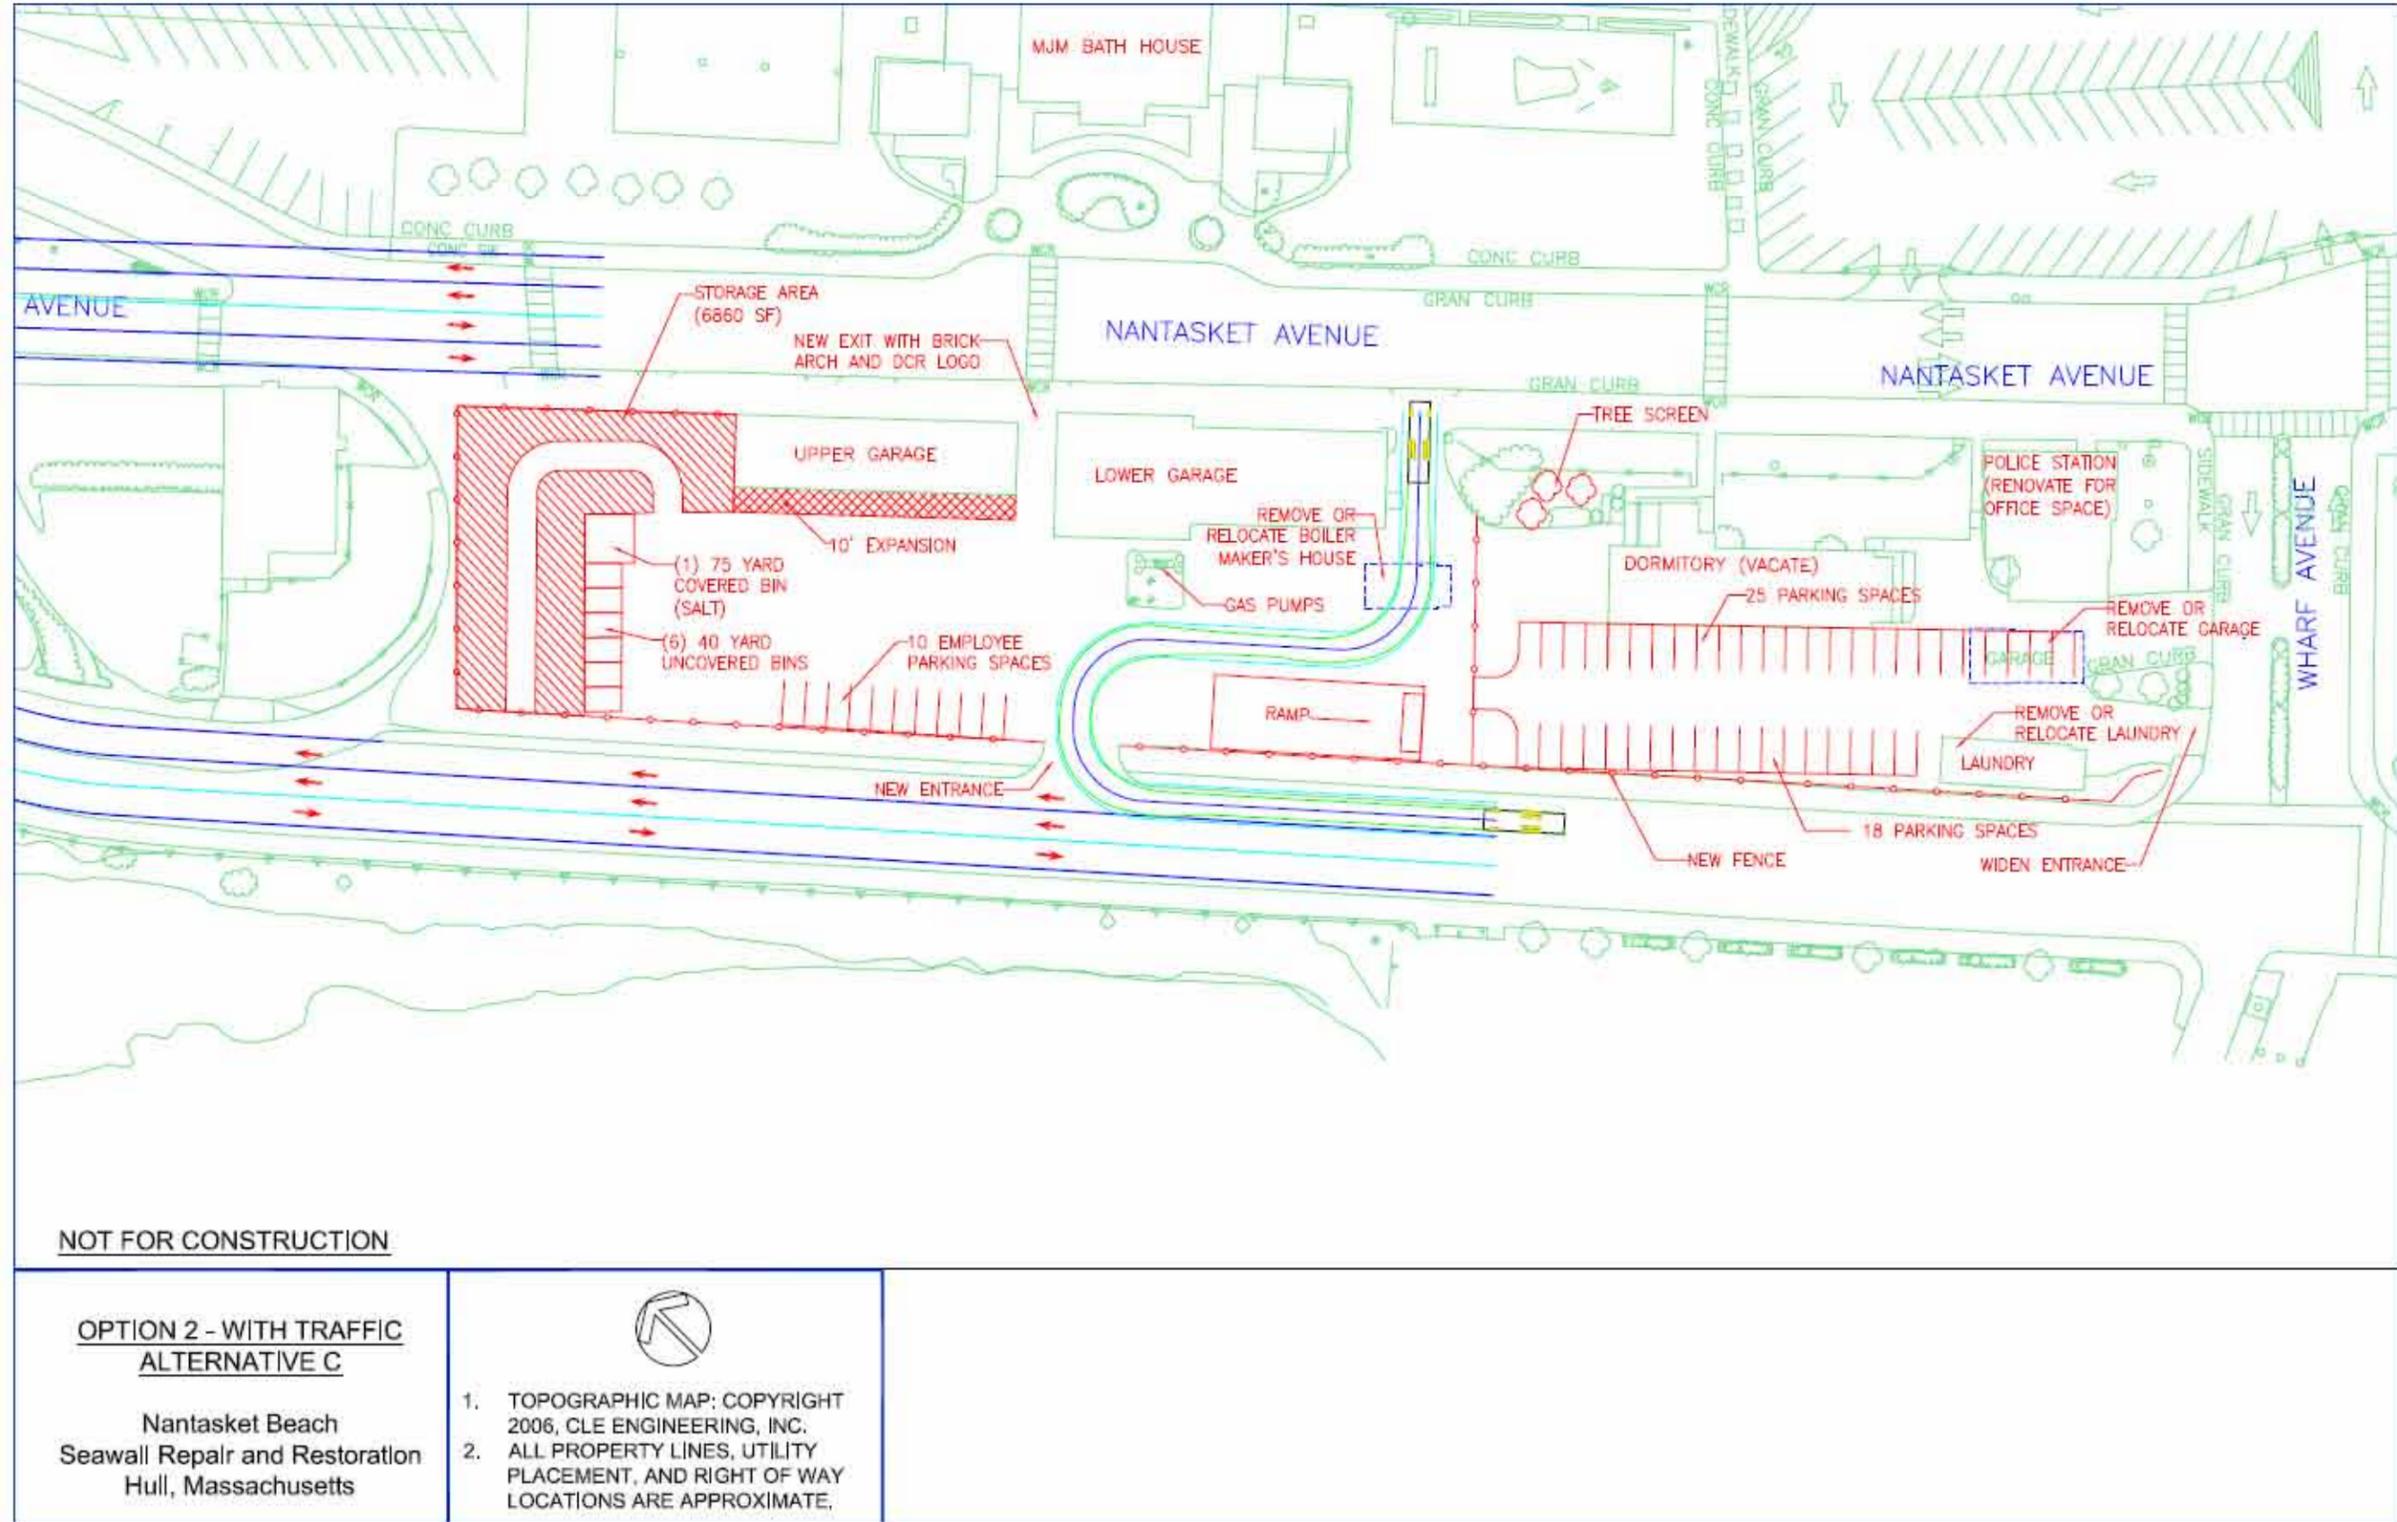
Facilities Layout Option 2 under Traffic Alternative C
